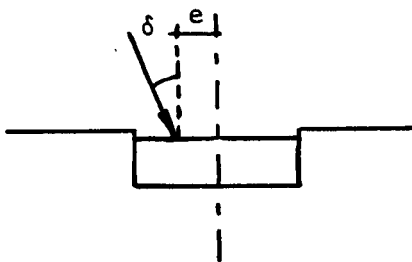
Shallow footing eccentrically loaded with a load inclined towards the center.
